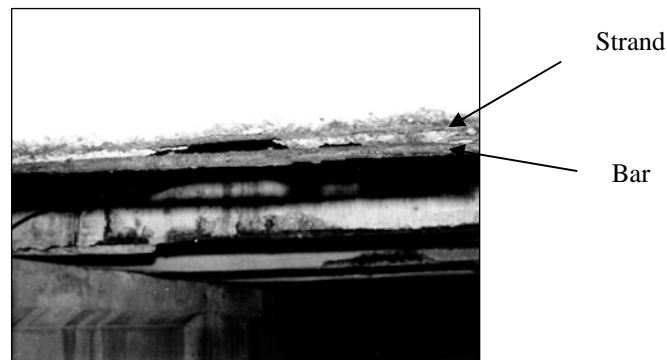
Prestressed concrete roof elements ECP: cracking and spalling of the concrete cover; advanced corrosion of the non-pre-tensioned bar and pre-tensioned strand.
